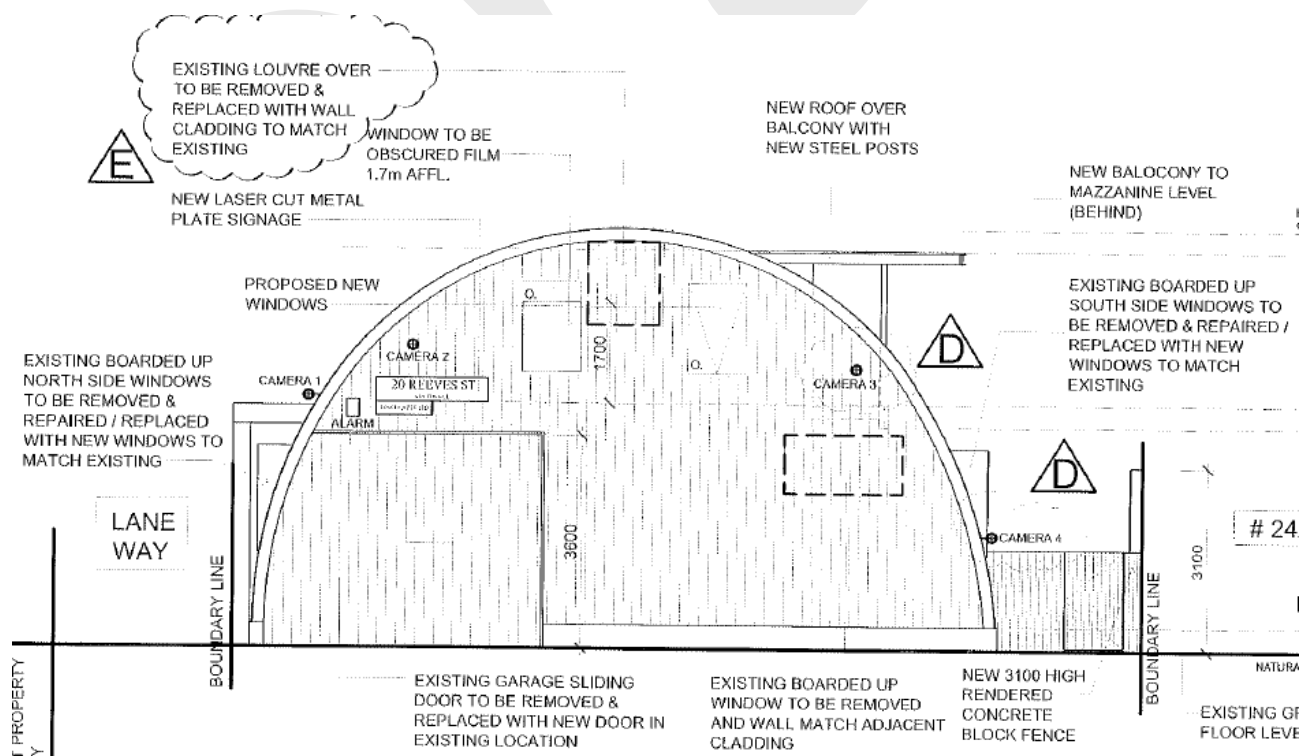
West elevation showing proposed works. Drawing dated 2009 (YCC BP).
